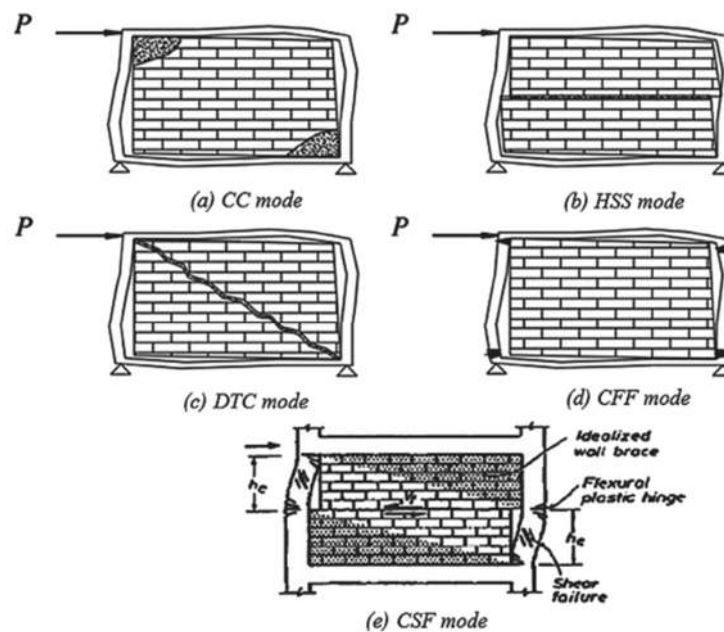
Different failure modes of infilled frame: (a) corner crushing; (b) horizontal sliding shear; (c) diagonal tension cracking; (d) column flexural; and (e) column shear from Penava et al. (2018)
